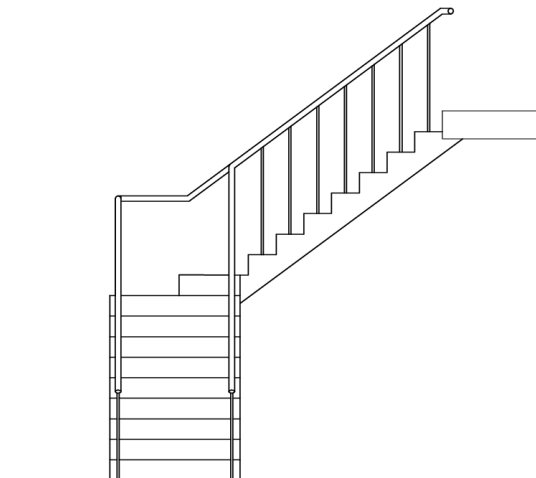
/§69.6. The example of winder stairs and the way their steps should be designed
